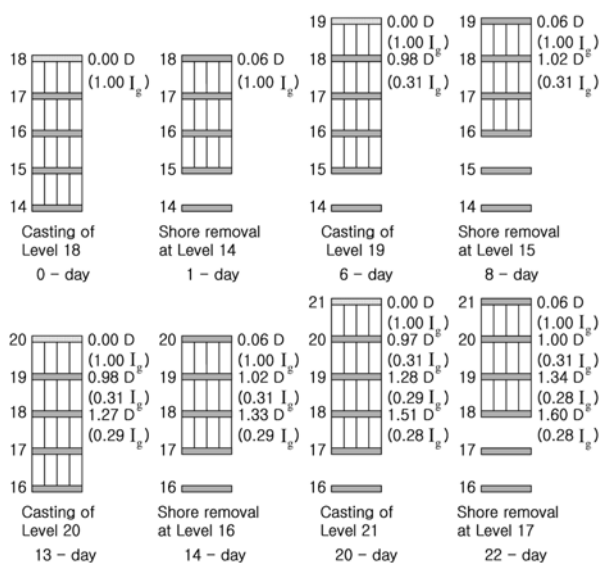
Slab construction load and effective stiffness for proposed method PM-IK (S-building)
